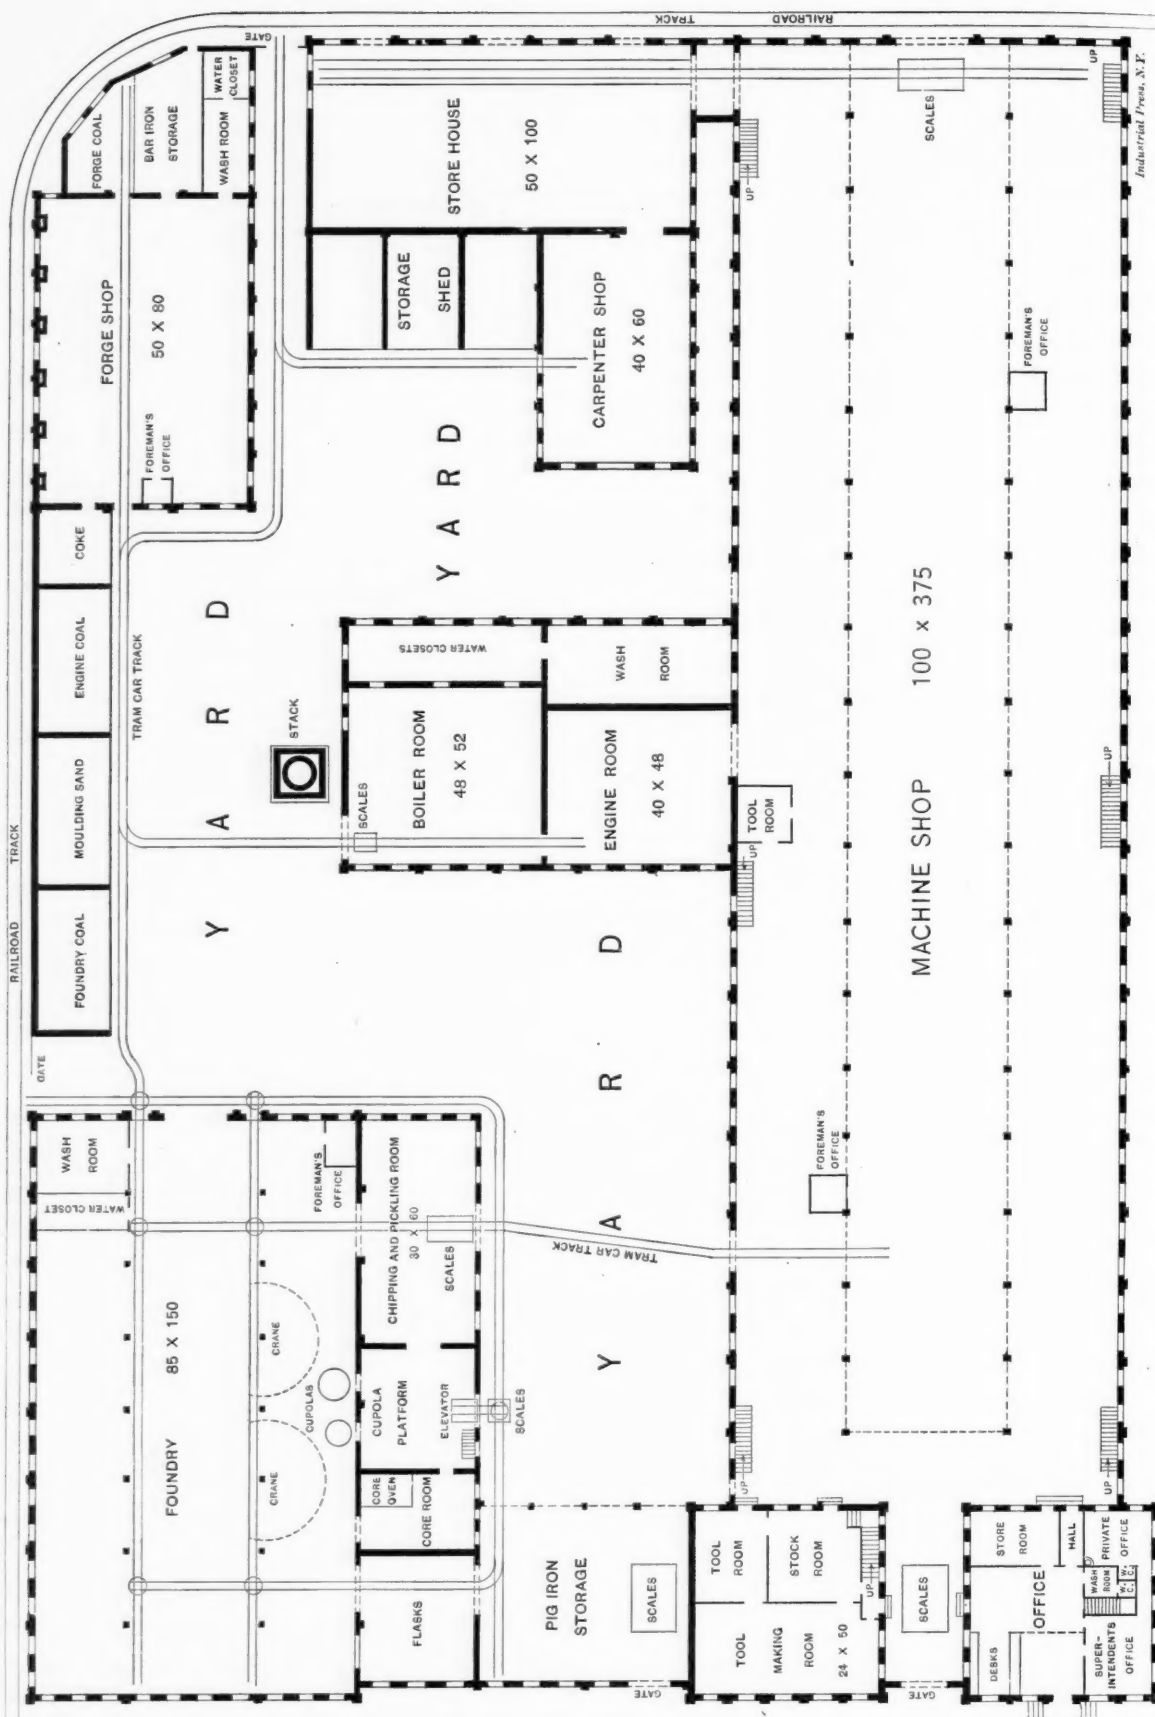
Plan of Works shown in Elevation on the first page. Scale, one inch equals forty-eight feet.
